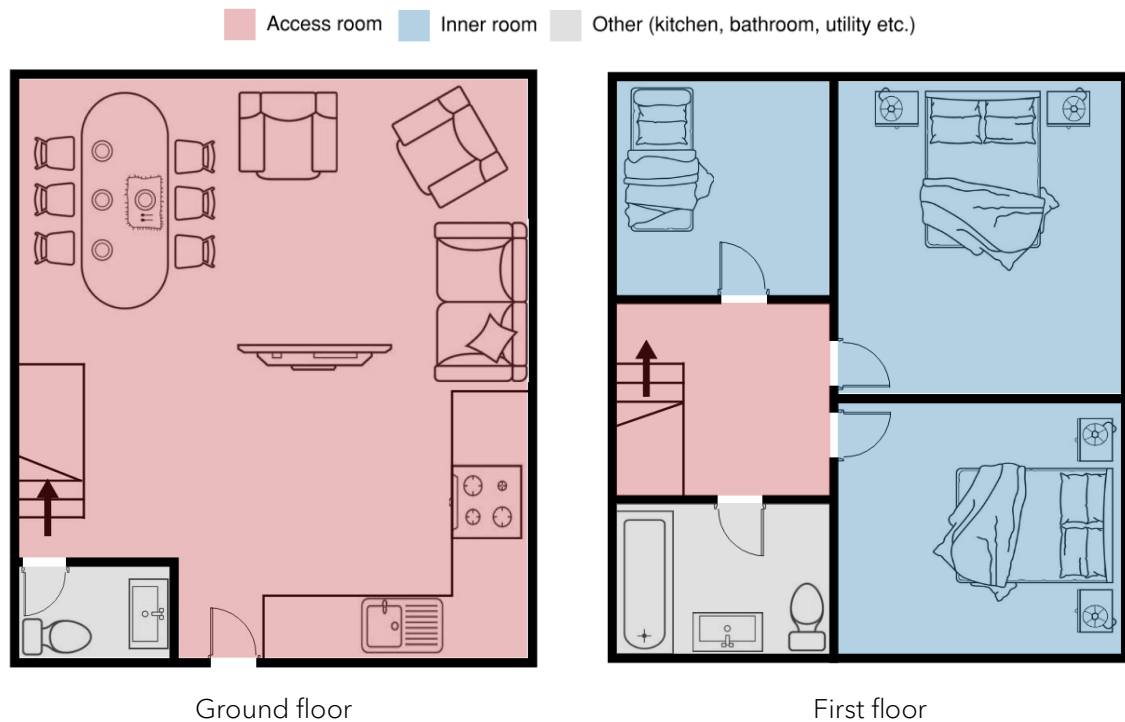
Example layout for a two-storey dwellinghouse with an unenclosed stair
